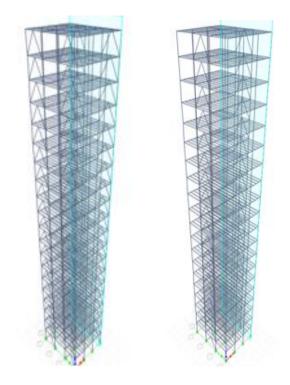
3D elevation view of inverted V-bracings at outer and inner bays
